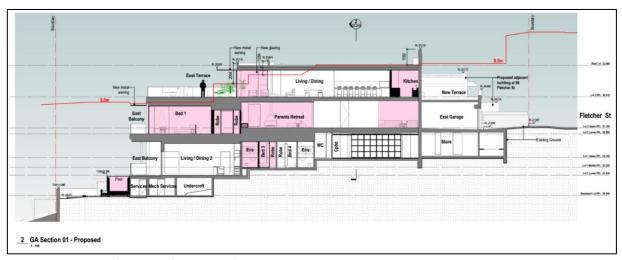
Extract of Section (DA1-4110) showing building height non-compliance, as proposed.
